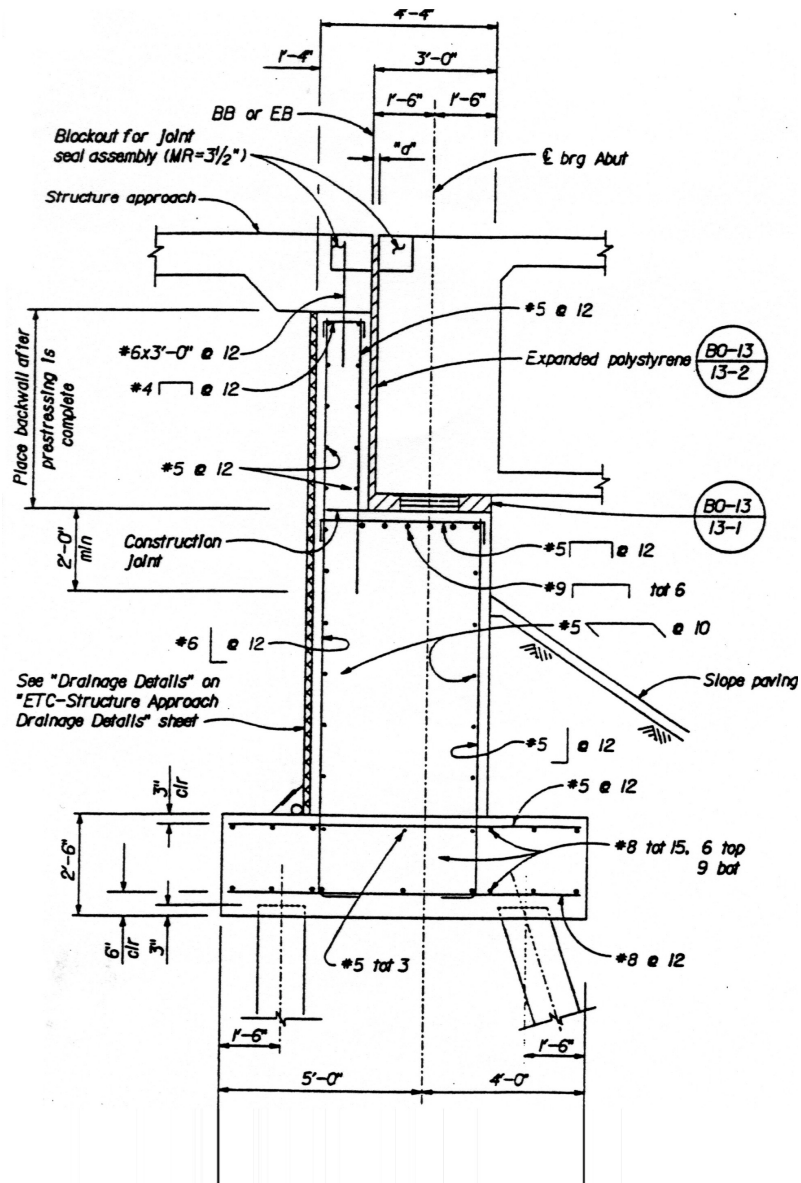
Typical Abutment Section at Jamboree Road Overcrossing
